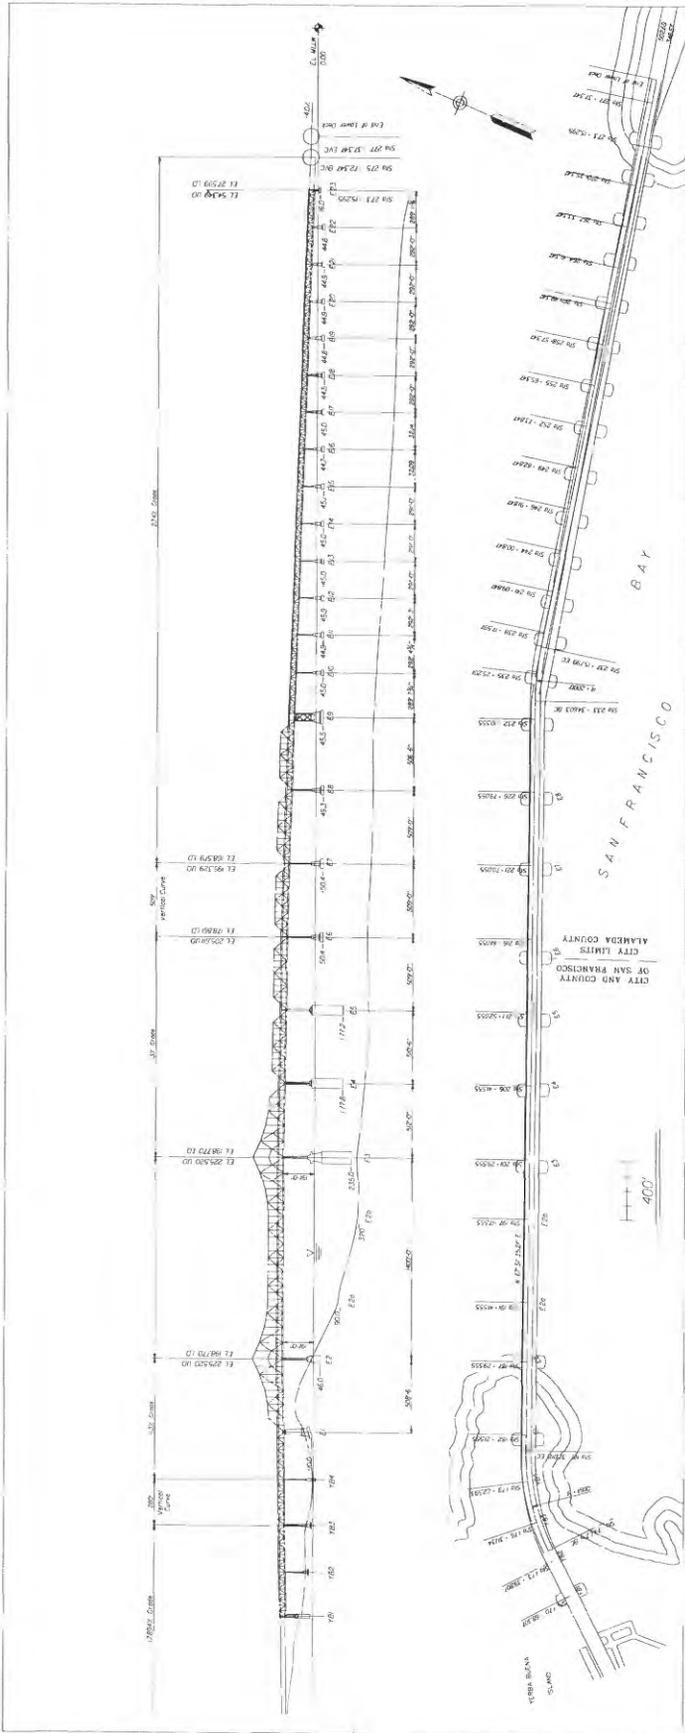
Plan and elevation drawings of the East Bay Crossing.
